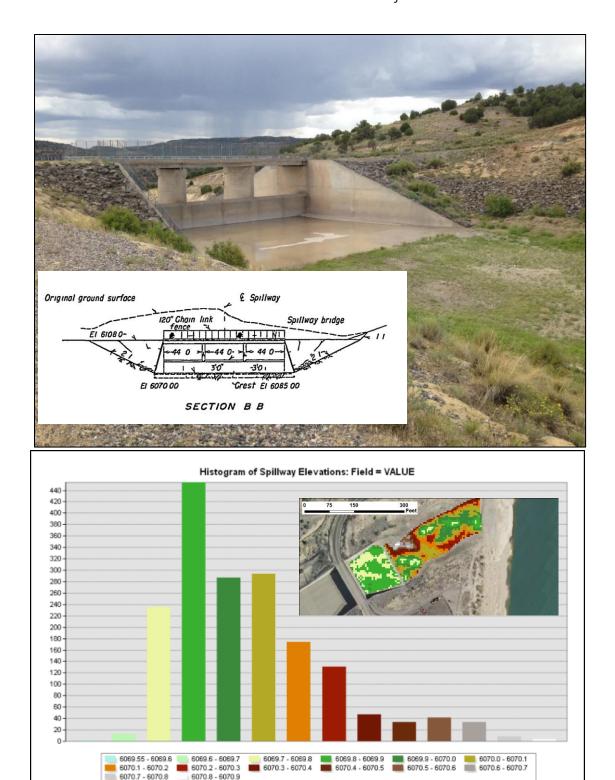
LiDAR verification after shifting down 2.97 ft. Top: photo of the concrete approach to the spillway, along with an inset of the design drawing showing the design elevation of the concrete approach of 6070 ft (RPVD). Bottom: histogram of concrete approaching spillway from LiDAR data (after being shifted down 2.97 ft) aligning with design elevation of 6070 ft (RPVD).
